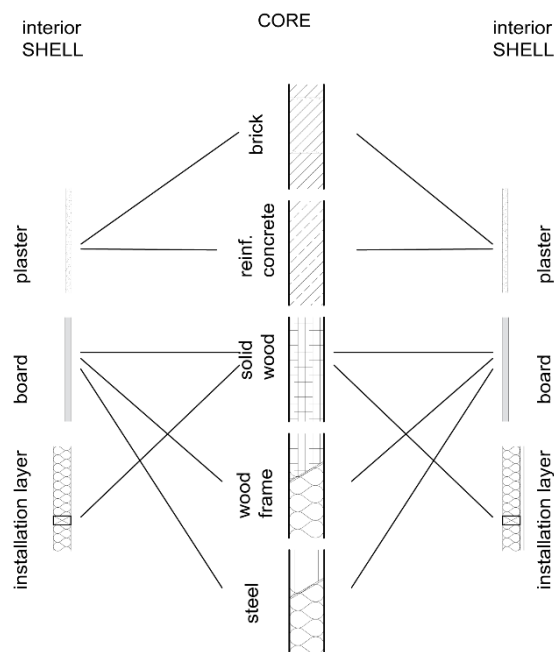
Possible component structures of cost group 340 Interior walls/ vertical building structures interior.
